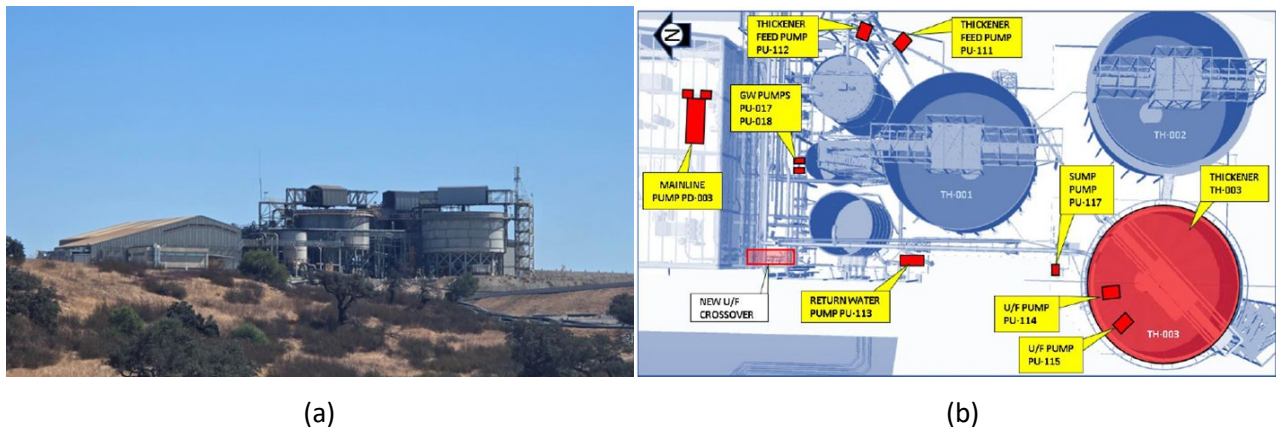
Tailings thickening plant. (a) West view; (b) New infrastructure build during zinc expansion project (red)
